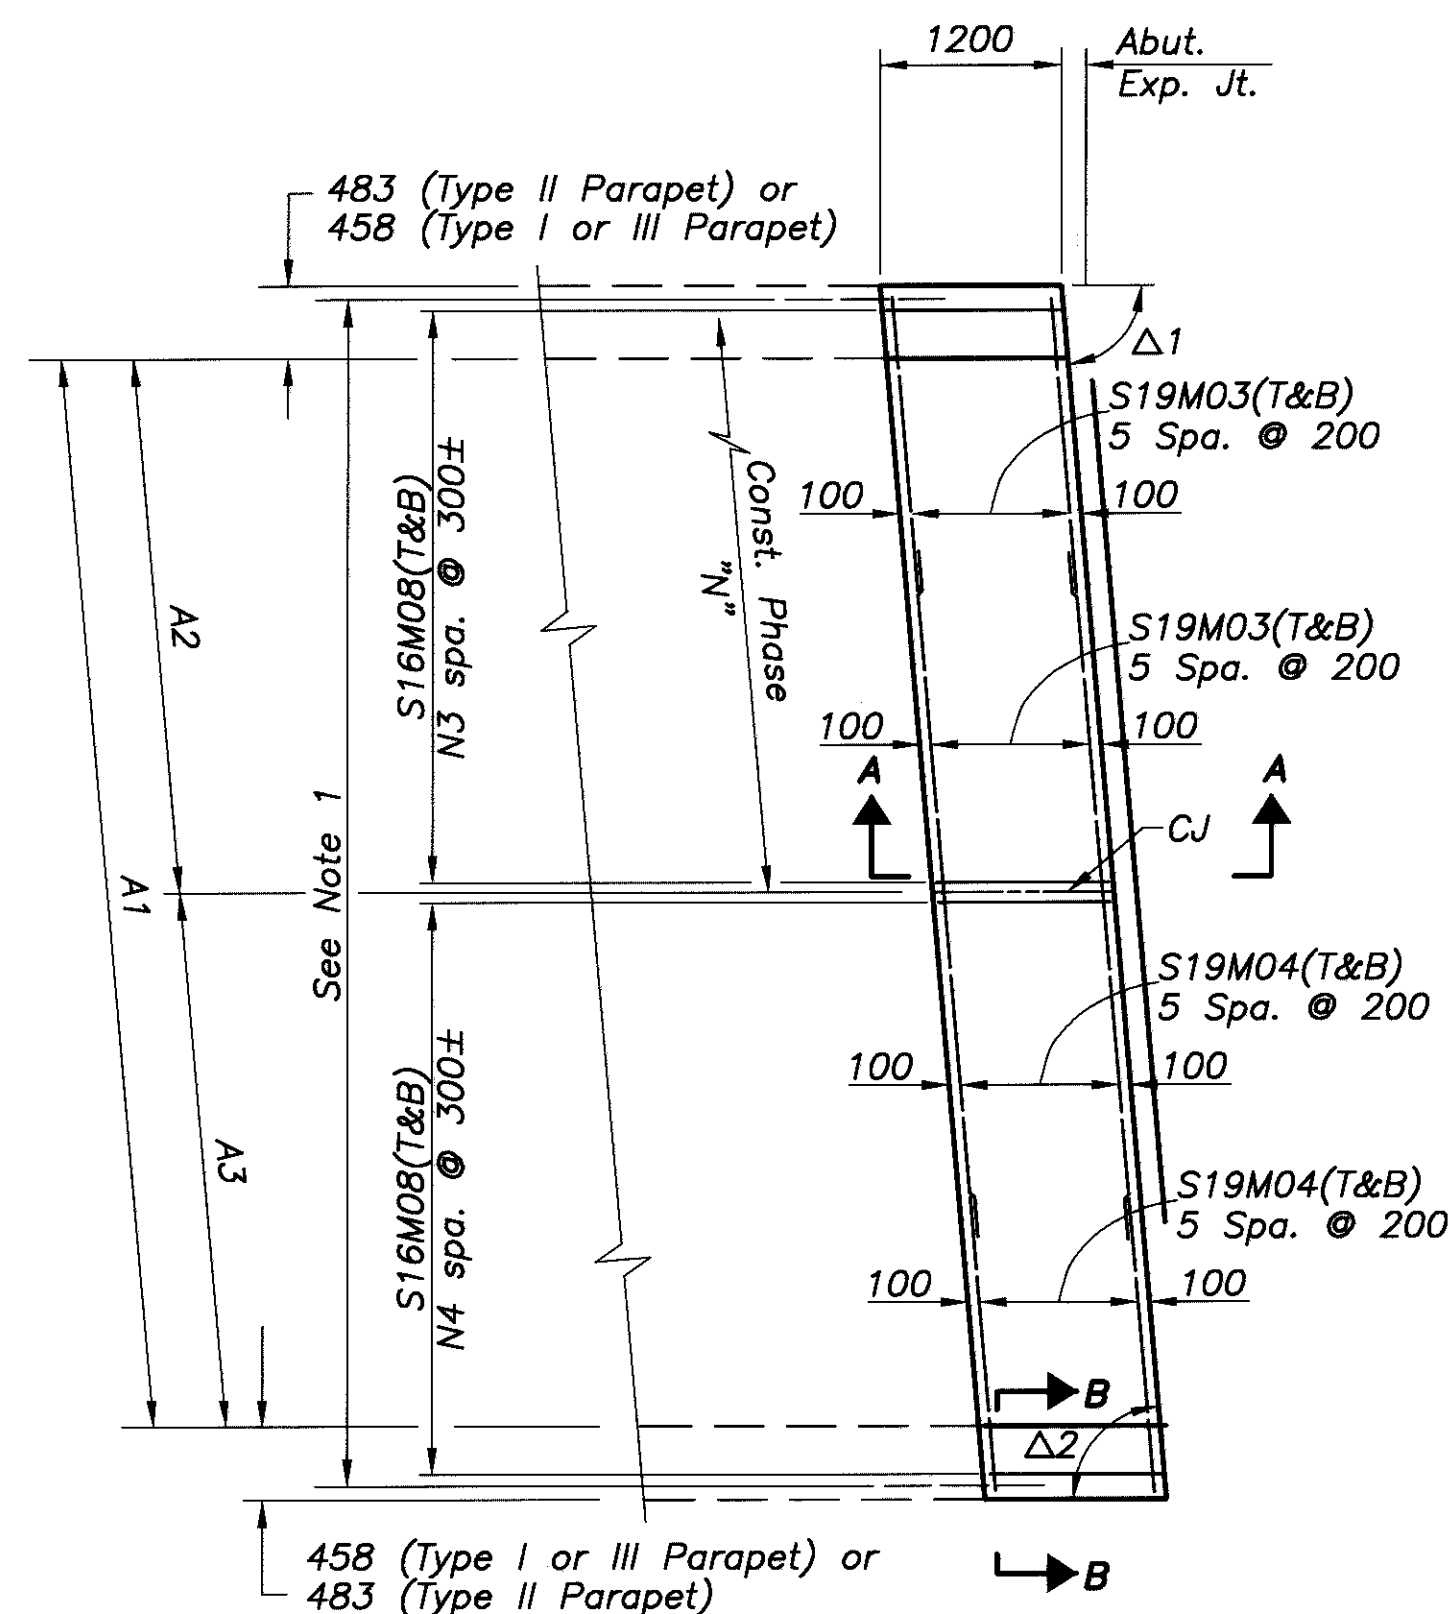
DETAILS FOR SLAB REPLACEMENT AT DECK JOINTS
